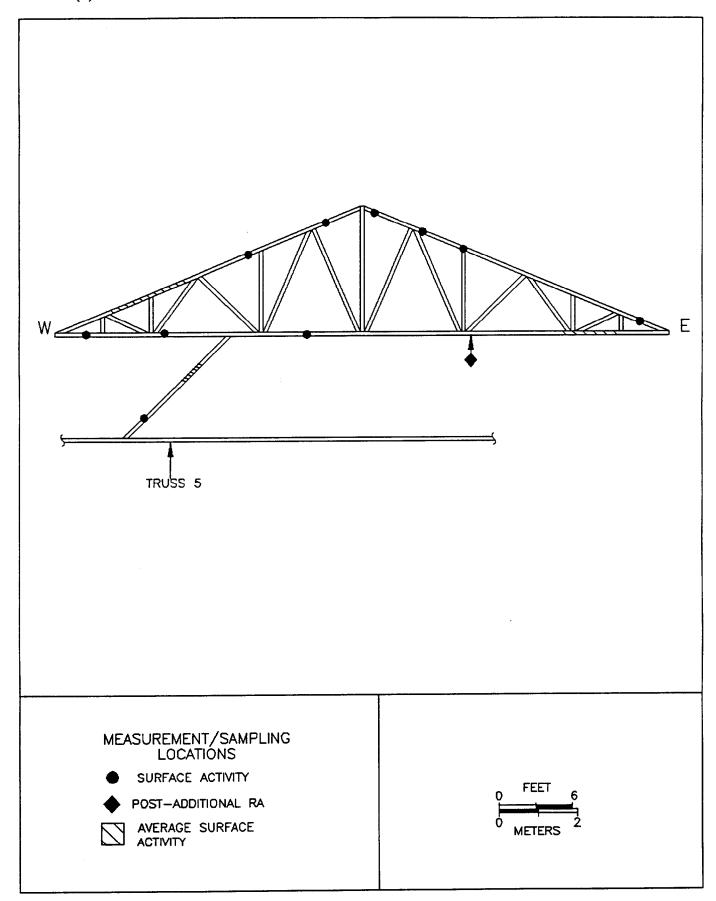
Building 3, Truss 6 — Measurement and Sampling Locations
